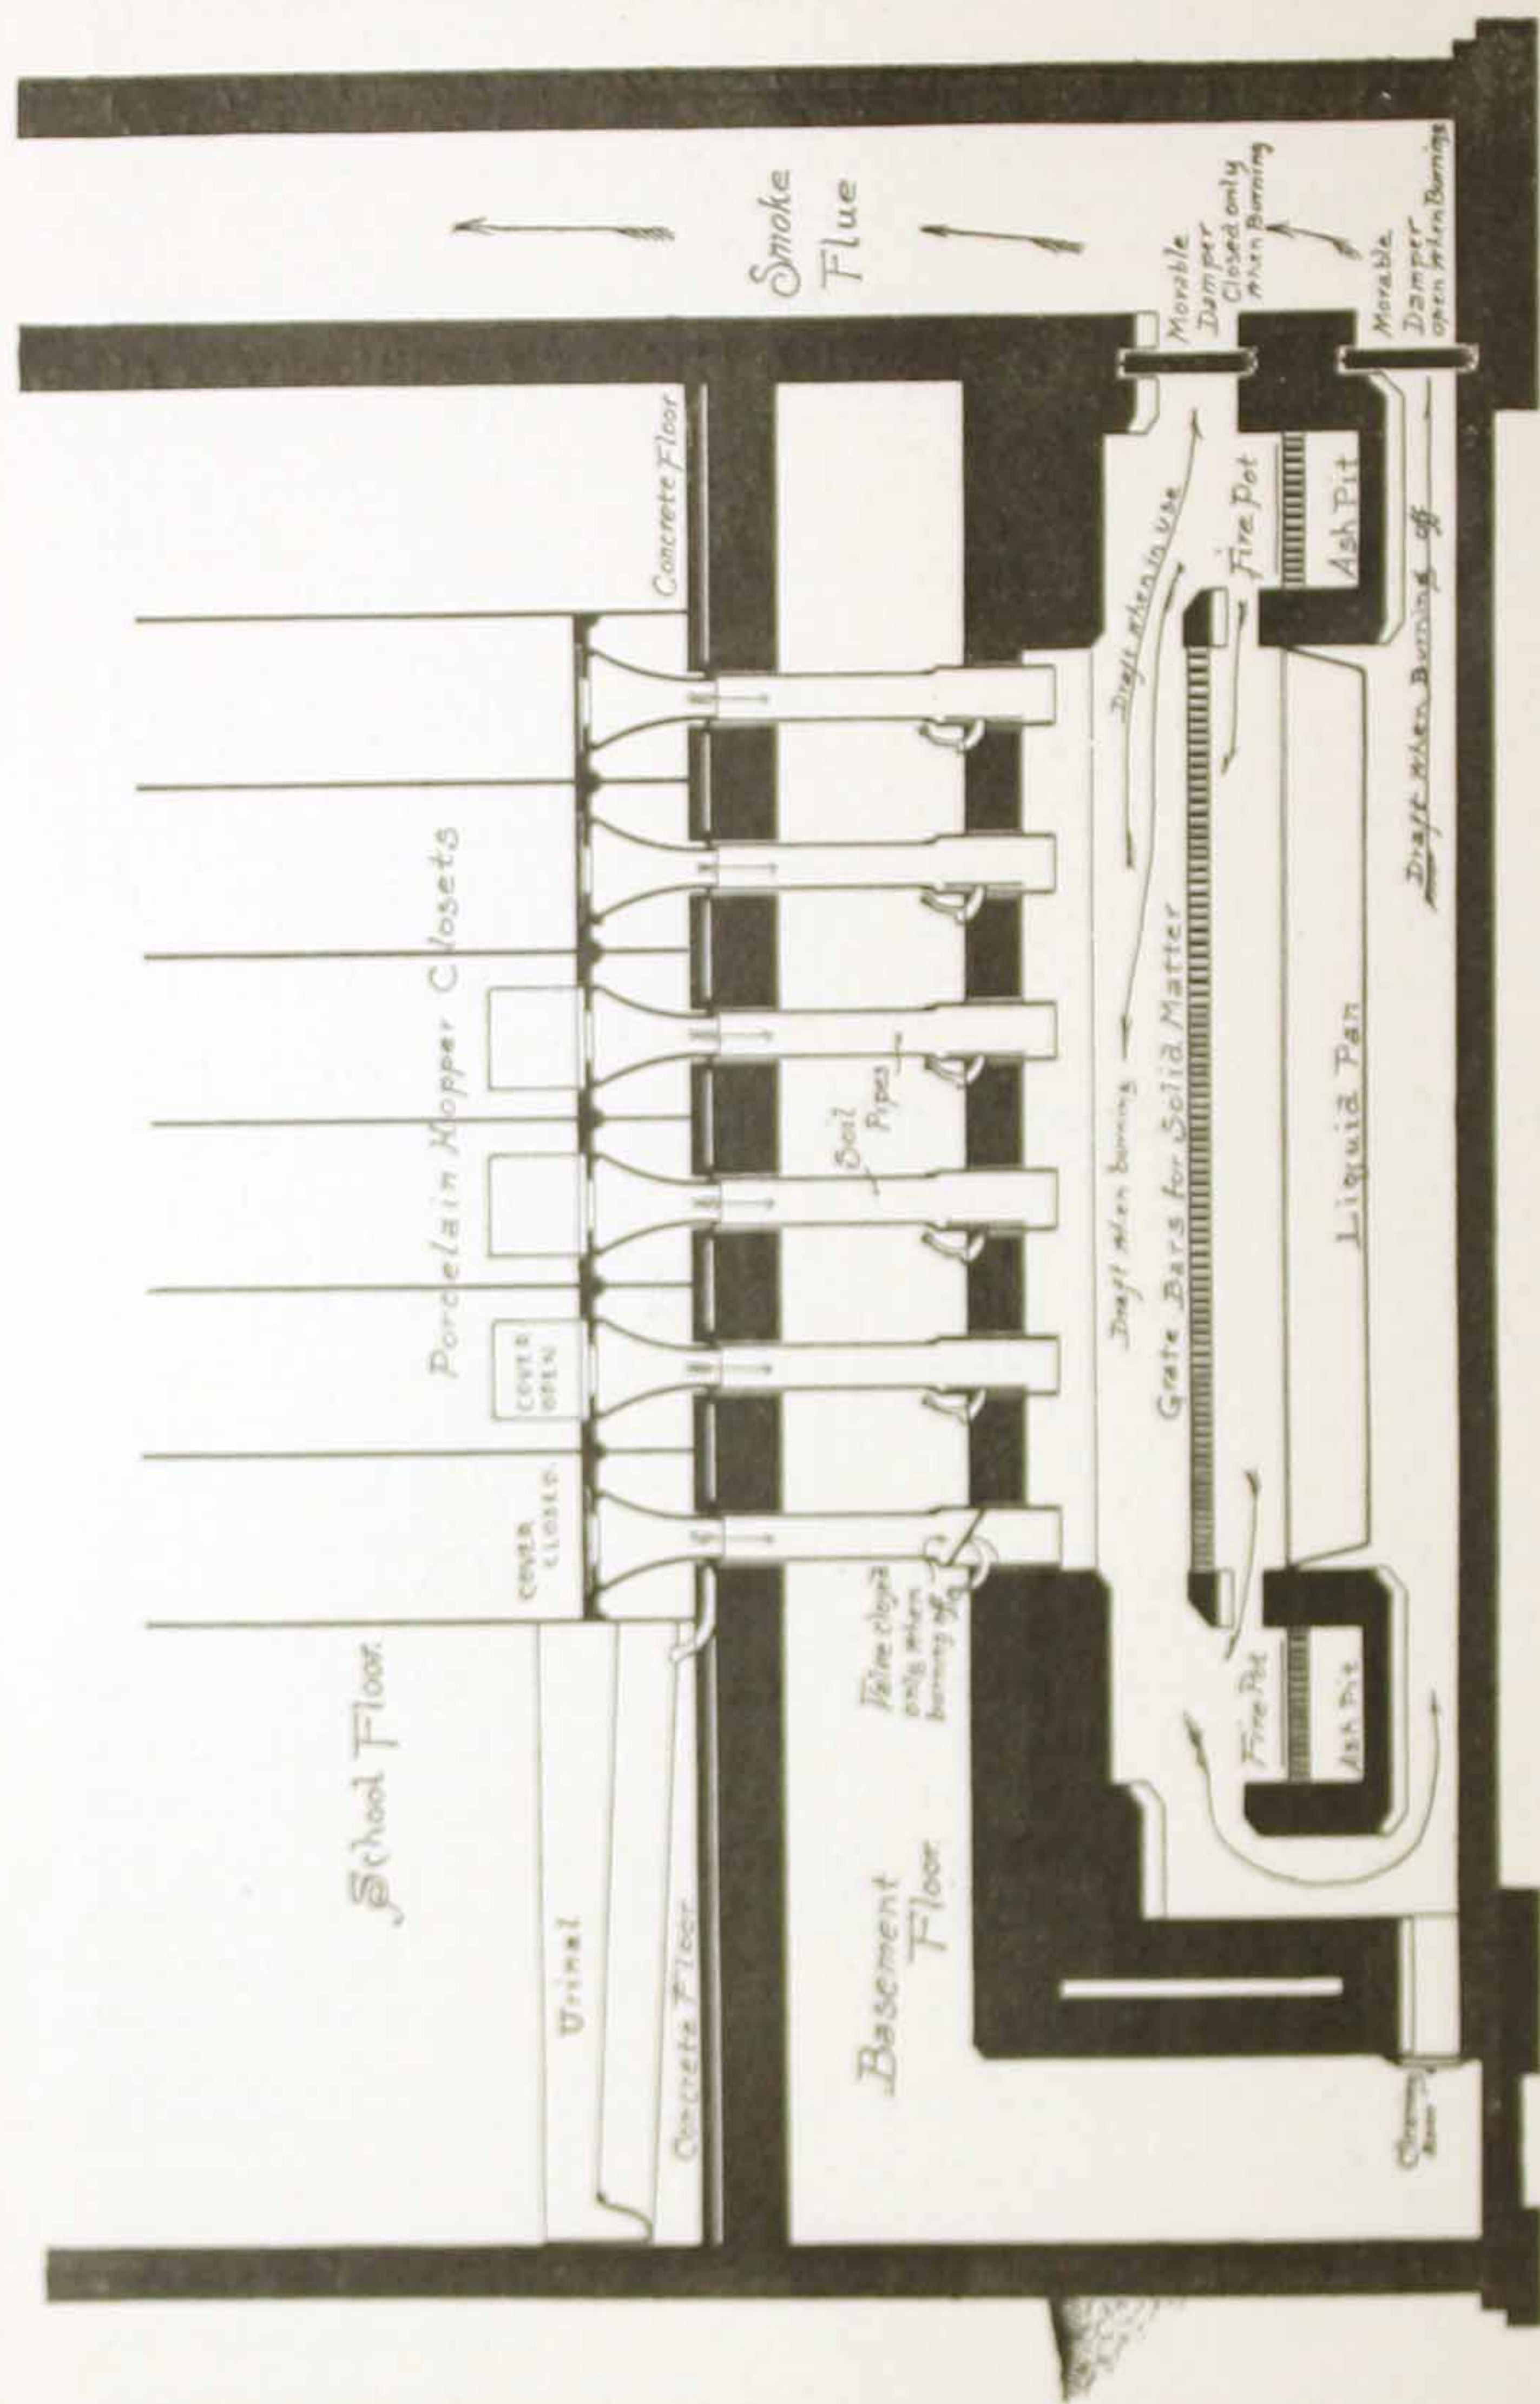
SIDE VIEW OF INTERIOR OF FIRE CLOSET AND SOIL PIPES CONNECTING WITH SEATS AND URINAL FROM FIRST FLOOR.
